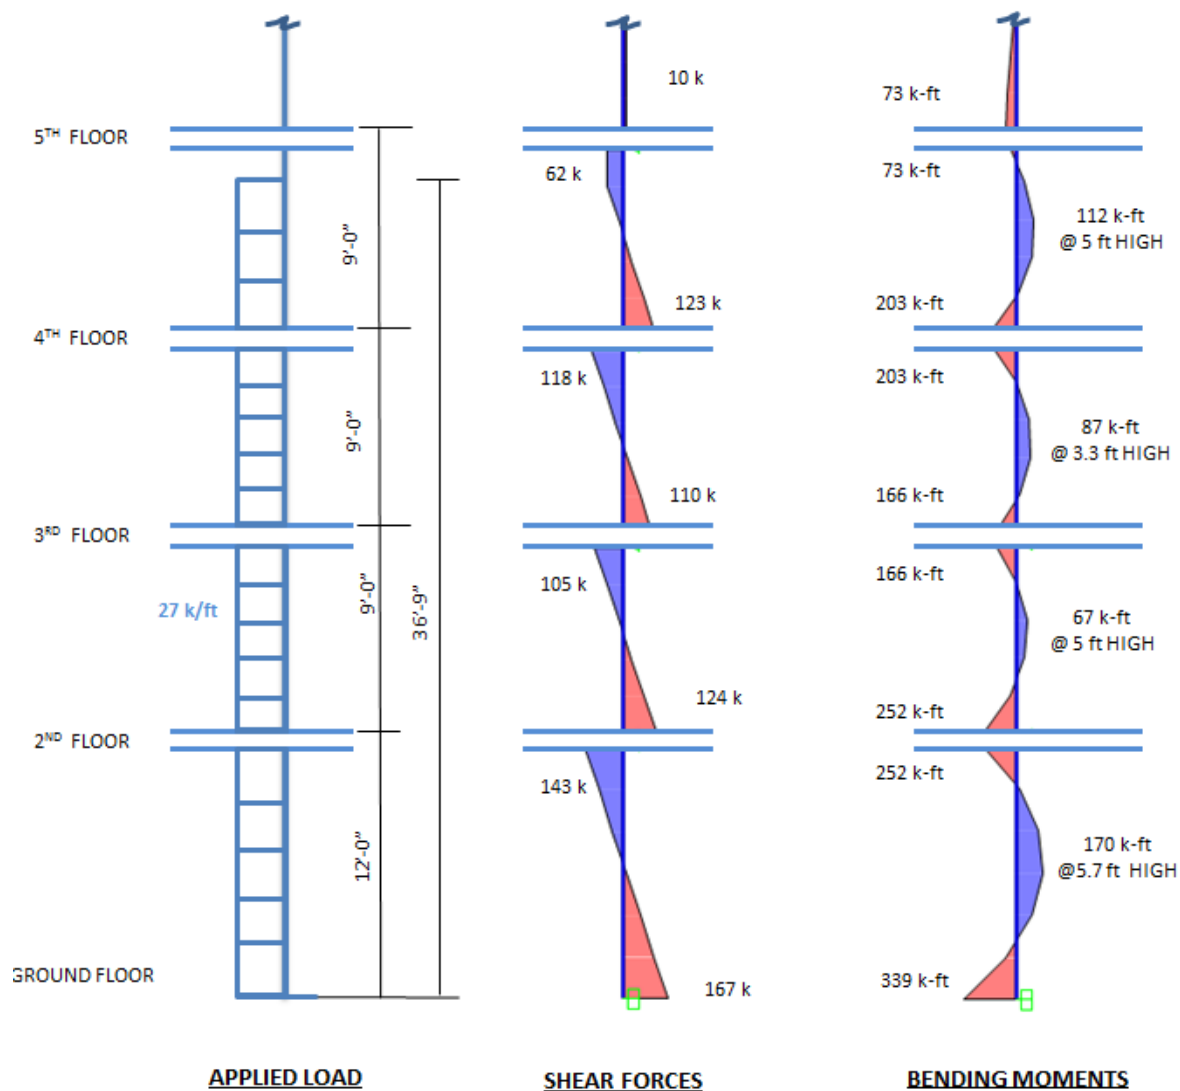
Hydrodynamic loading on exterior wall of Hilo residential building due to Load Case 2
